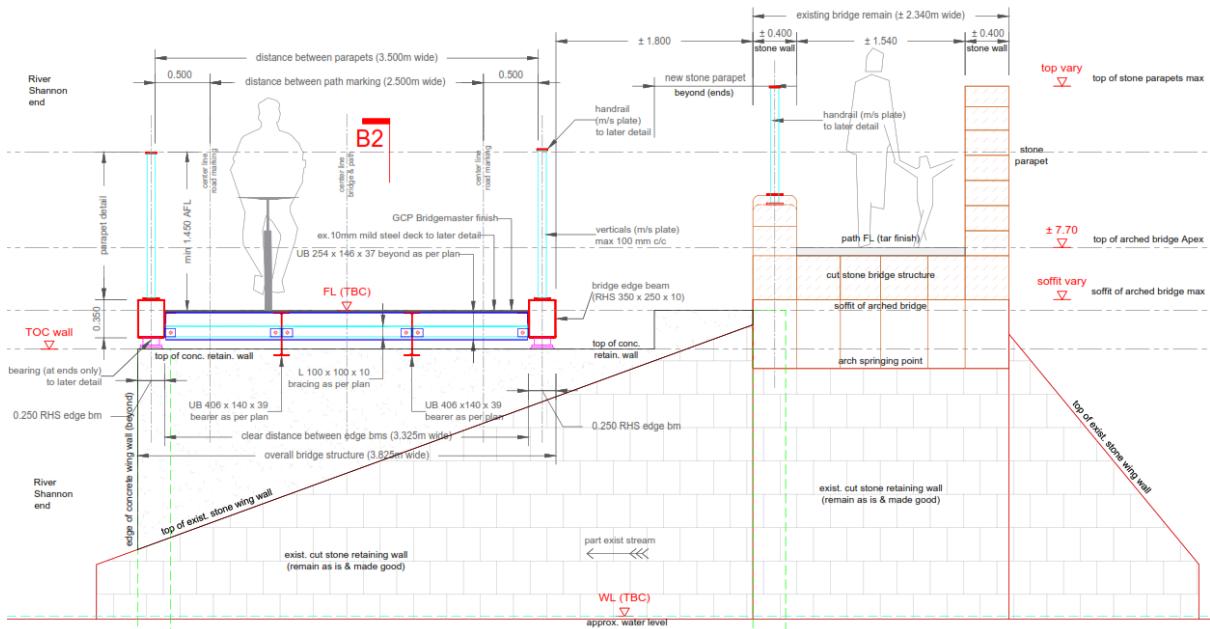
Section for the proposed new bridge 2 alongside the existing stone bridge (refer to drawing RHA-XX-DR-S-SP0021)
